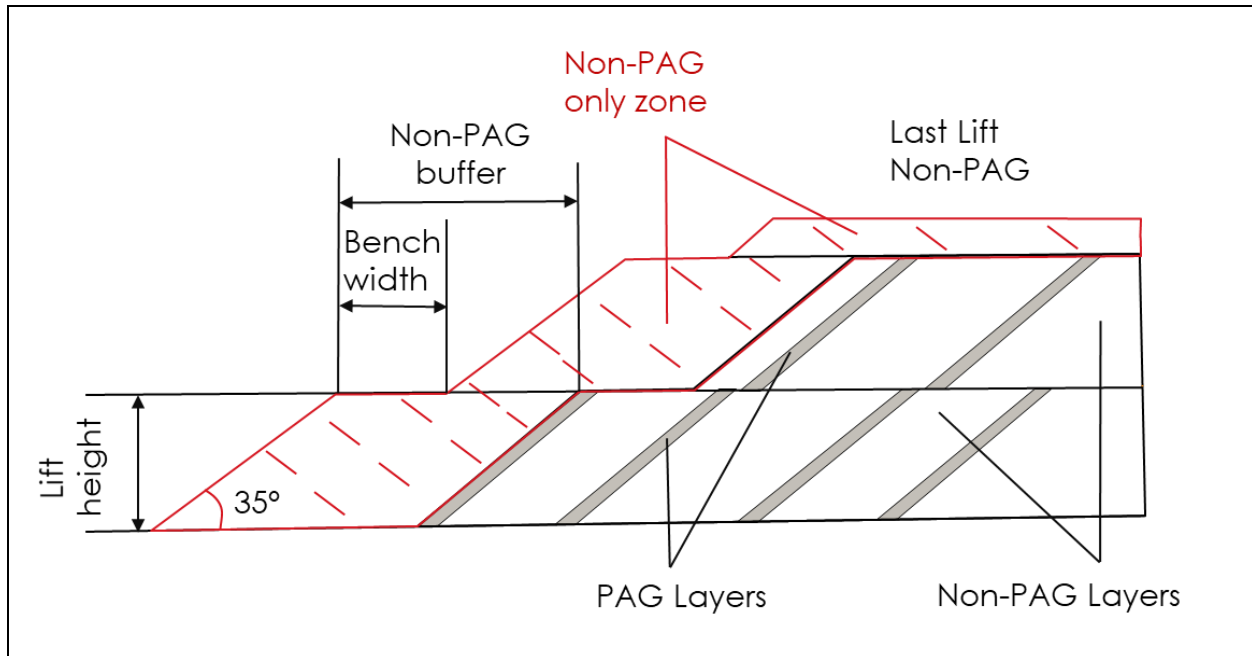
Conceptual Cross-Section of Waste Rock Pile
